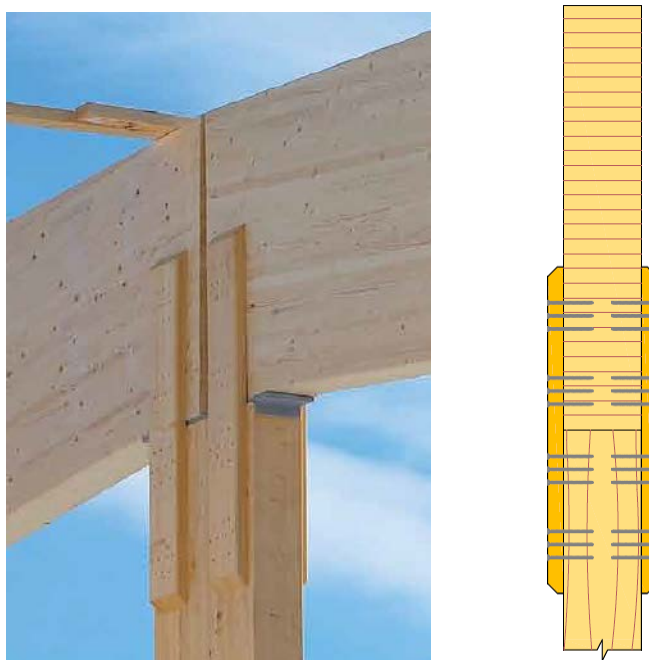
Hinged beam-to-column connection with supporting block-boards
